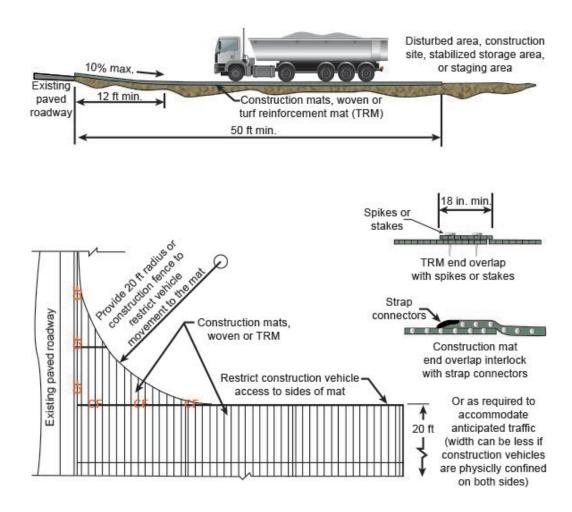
Vehicle-tracking control with construction mat or turf reinforcement mat (Colorado UDFCD 2010).
